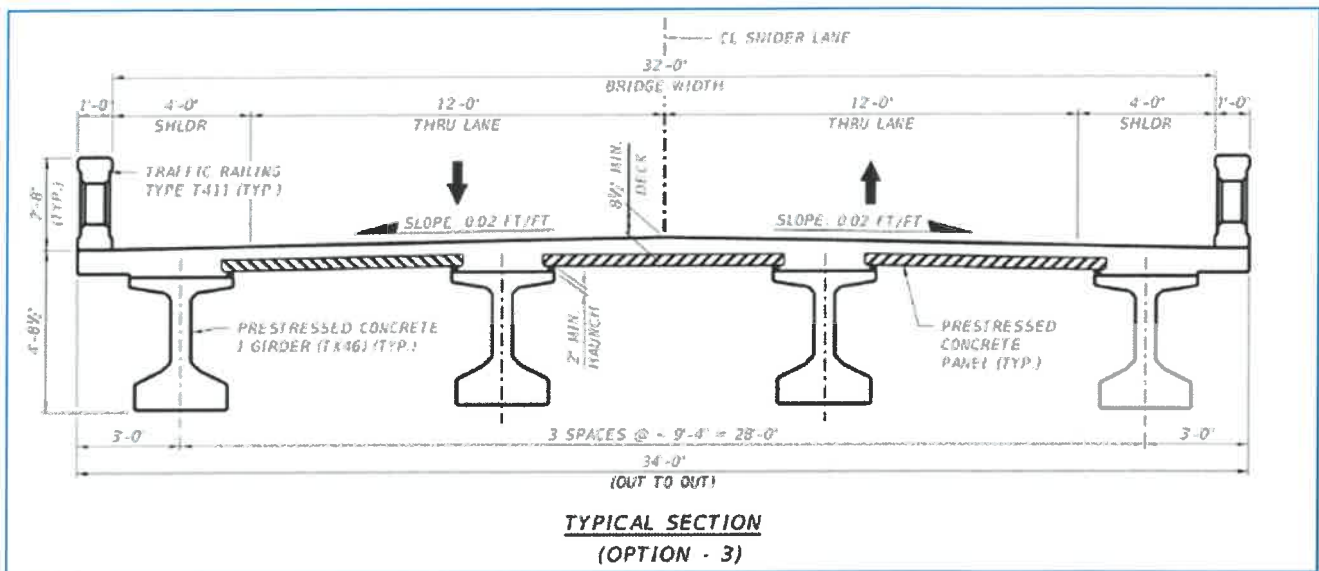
TxDOT Prestressed Concrete I-Girders (TX46) Typical Section
